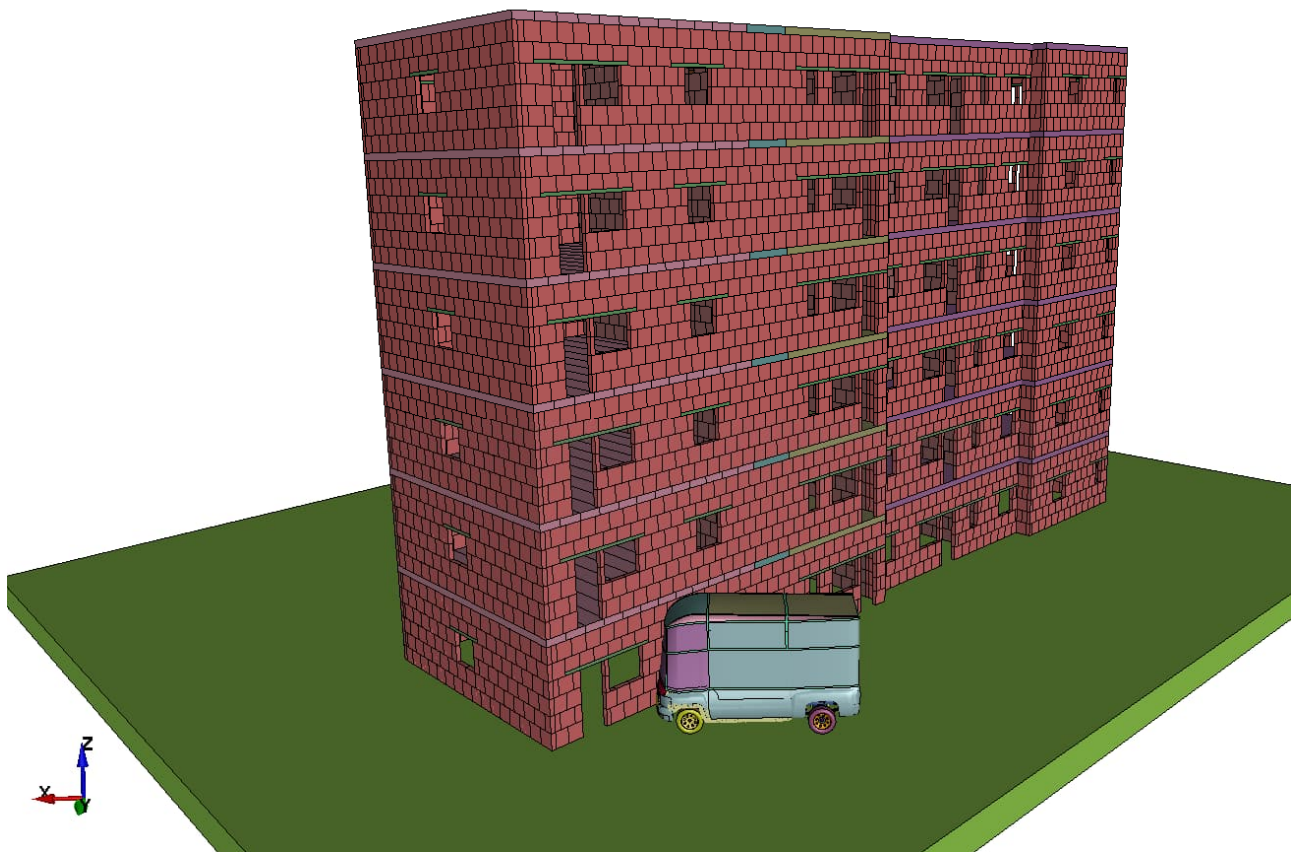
Initial state configuration of simulation 5, featuring a building model built with a one-axle reinforced concrete slab system, without ring beams and without vertical wall reinforcement, subjected to a vehicle impact at 80 km/h.
